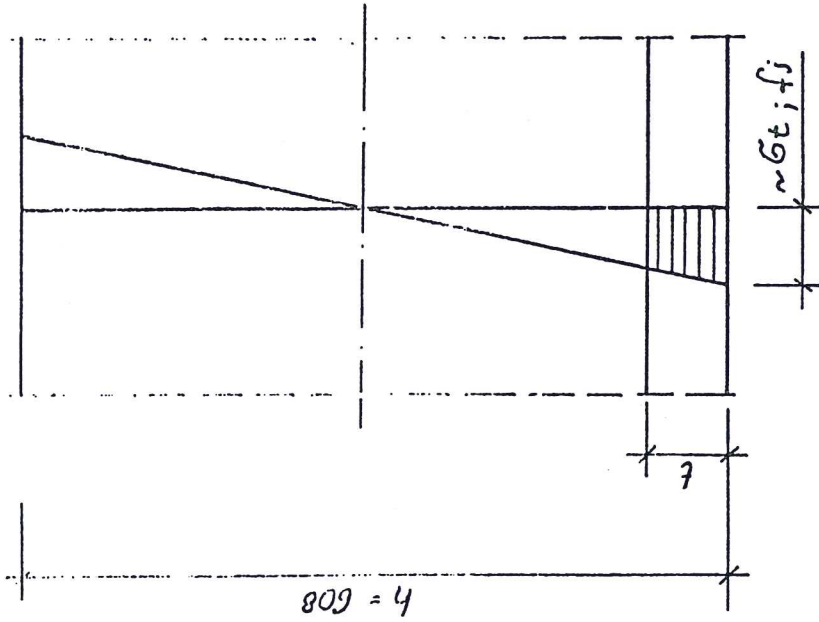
Stressing of the key - dovetail connection ("finger joint") with increasing depth of a joint laminated timber girder
